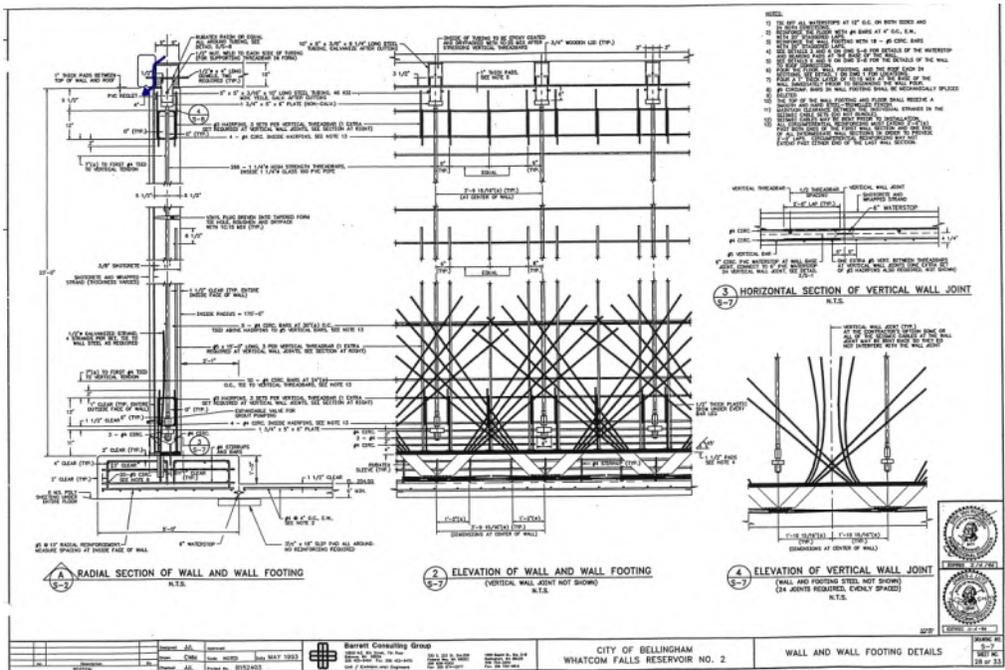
Whatcom Falls 2 - Wall Section and Seismic Cable Layout
